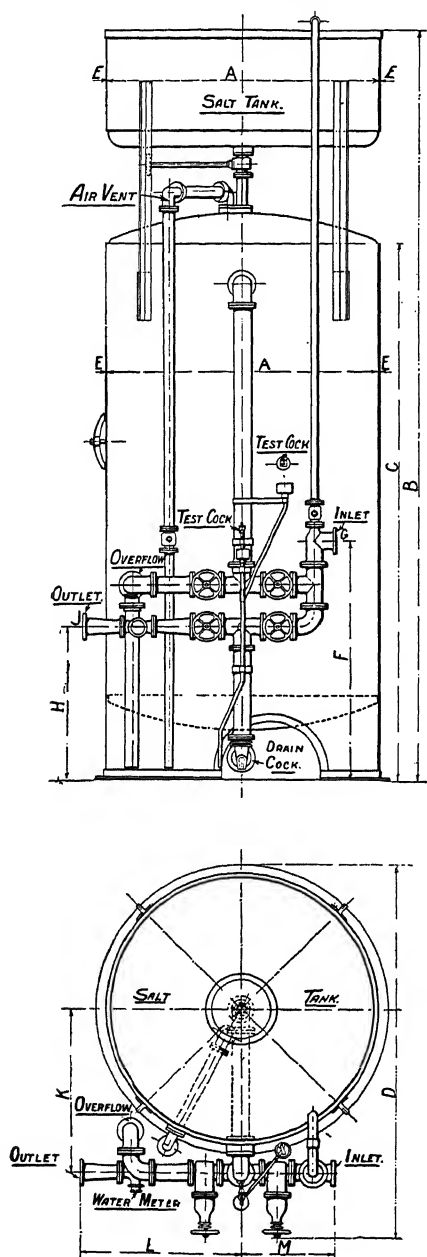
A.—SECTIONAL ELEVATION AND PLAN OF A PERMUTIT FILTER.
